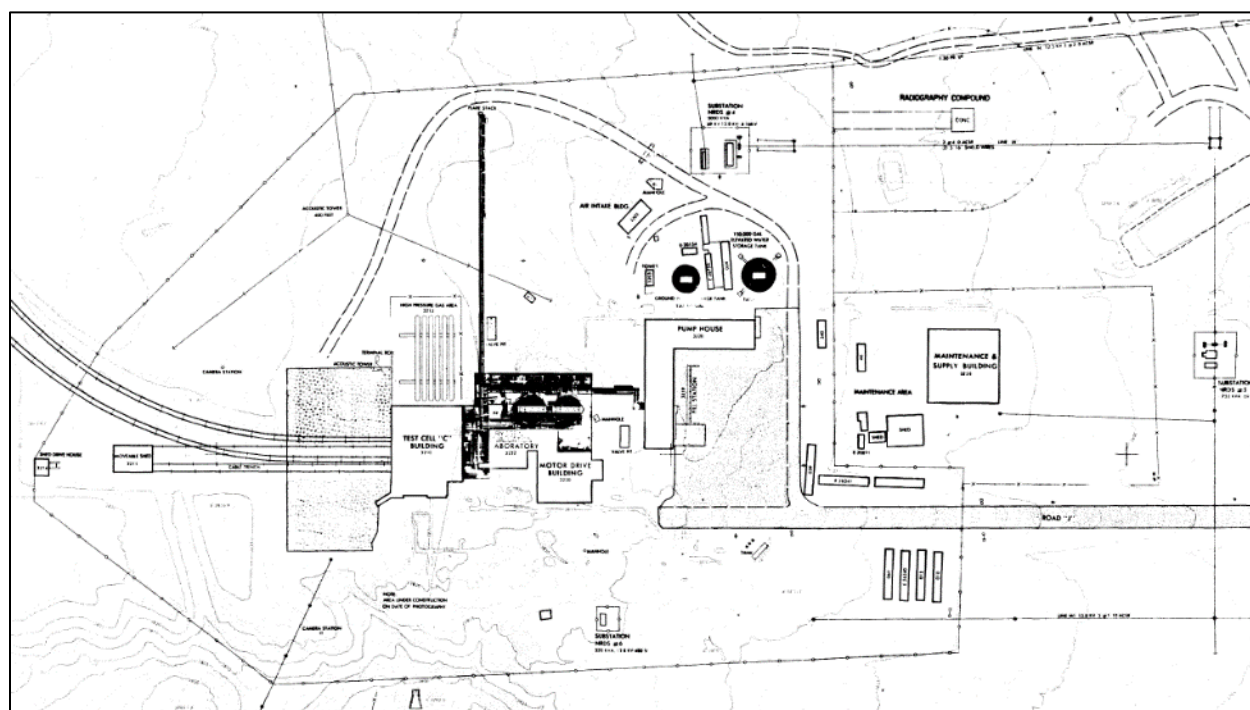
Plan of Test Cell C in early 1965 prior to the major expansion (detail from Koogle & Pouls Engineering Drawing NRDS-SF-M/C 6 (file 112716), 1965).
